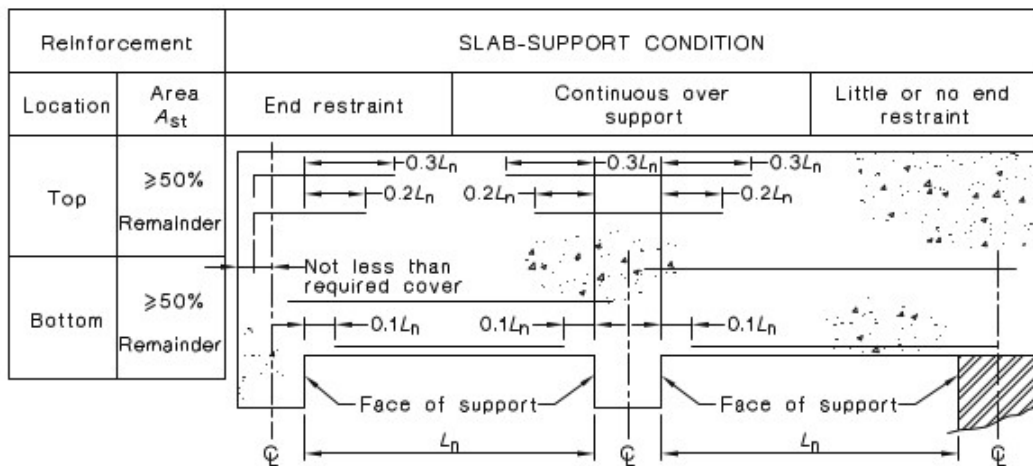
ARRANGEMENT OF REINFORCEMENT
